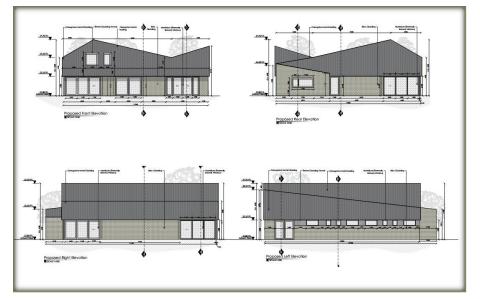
Site Plan, Proposed Elevations (as prepared by Craft Studio Architects)
